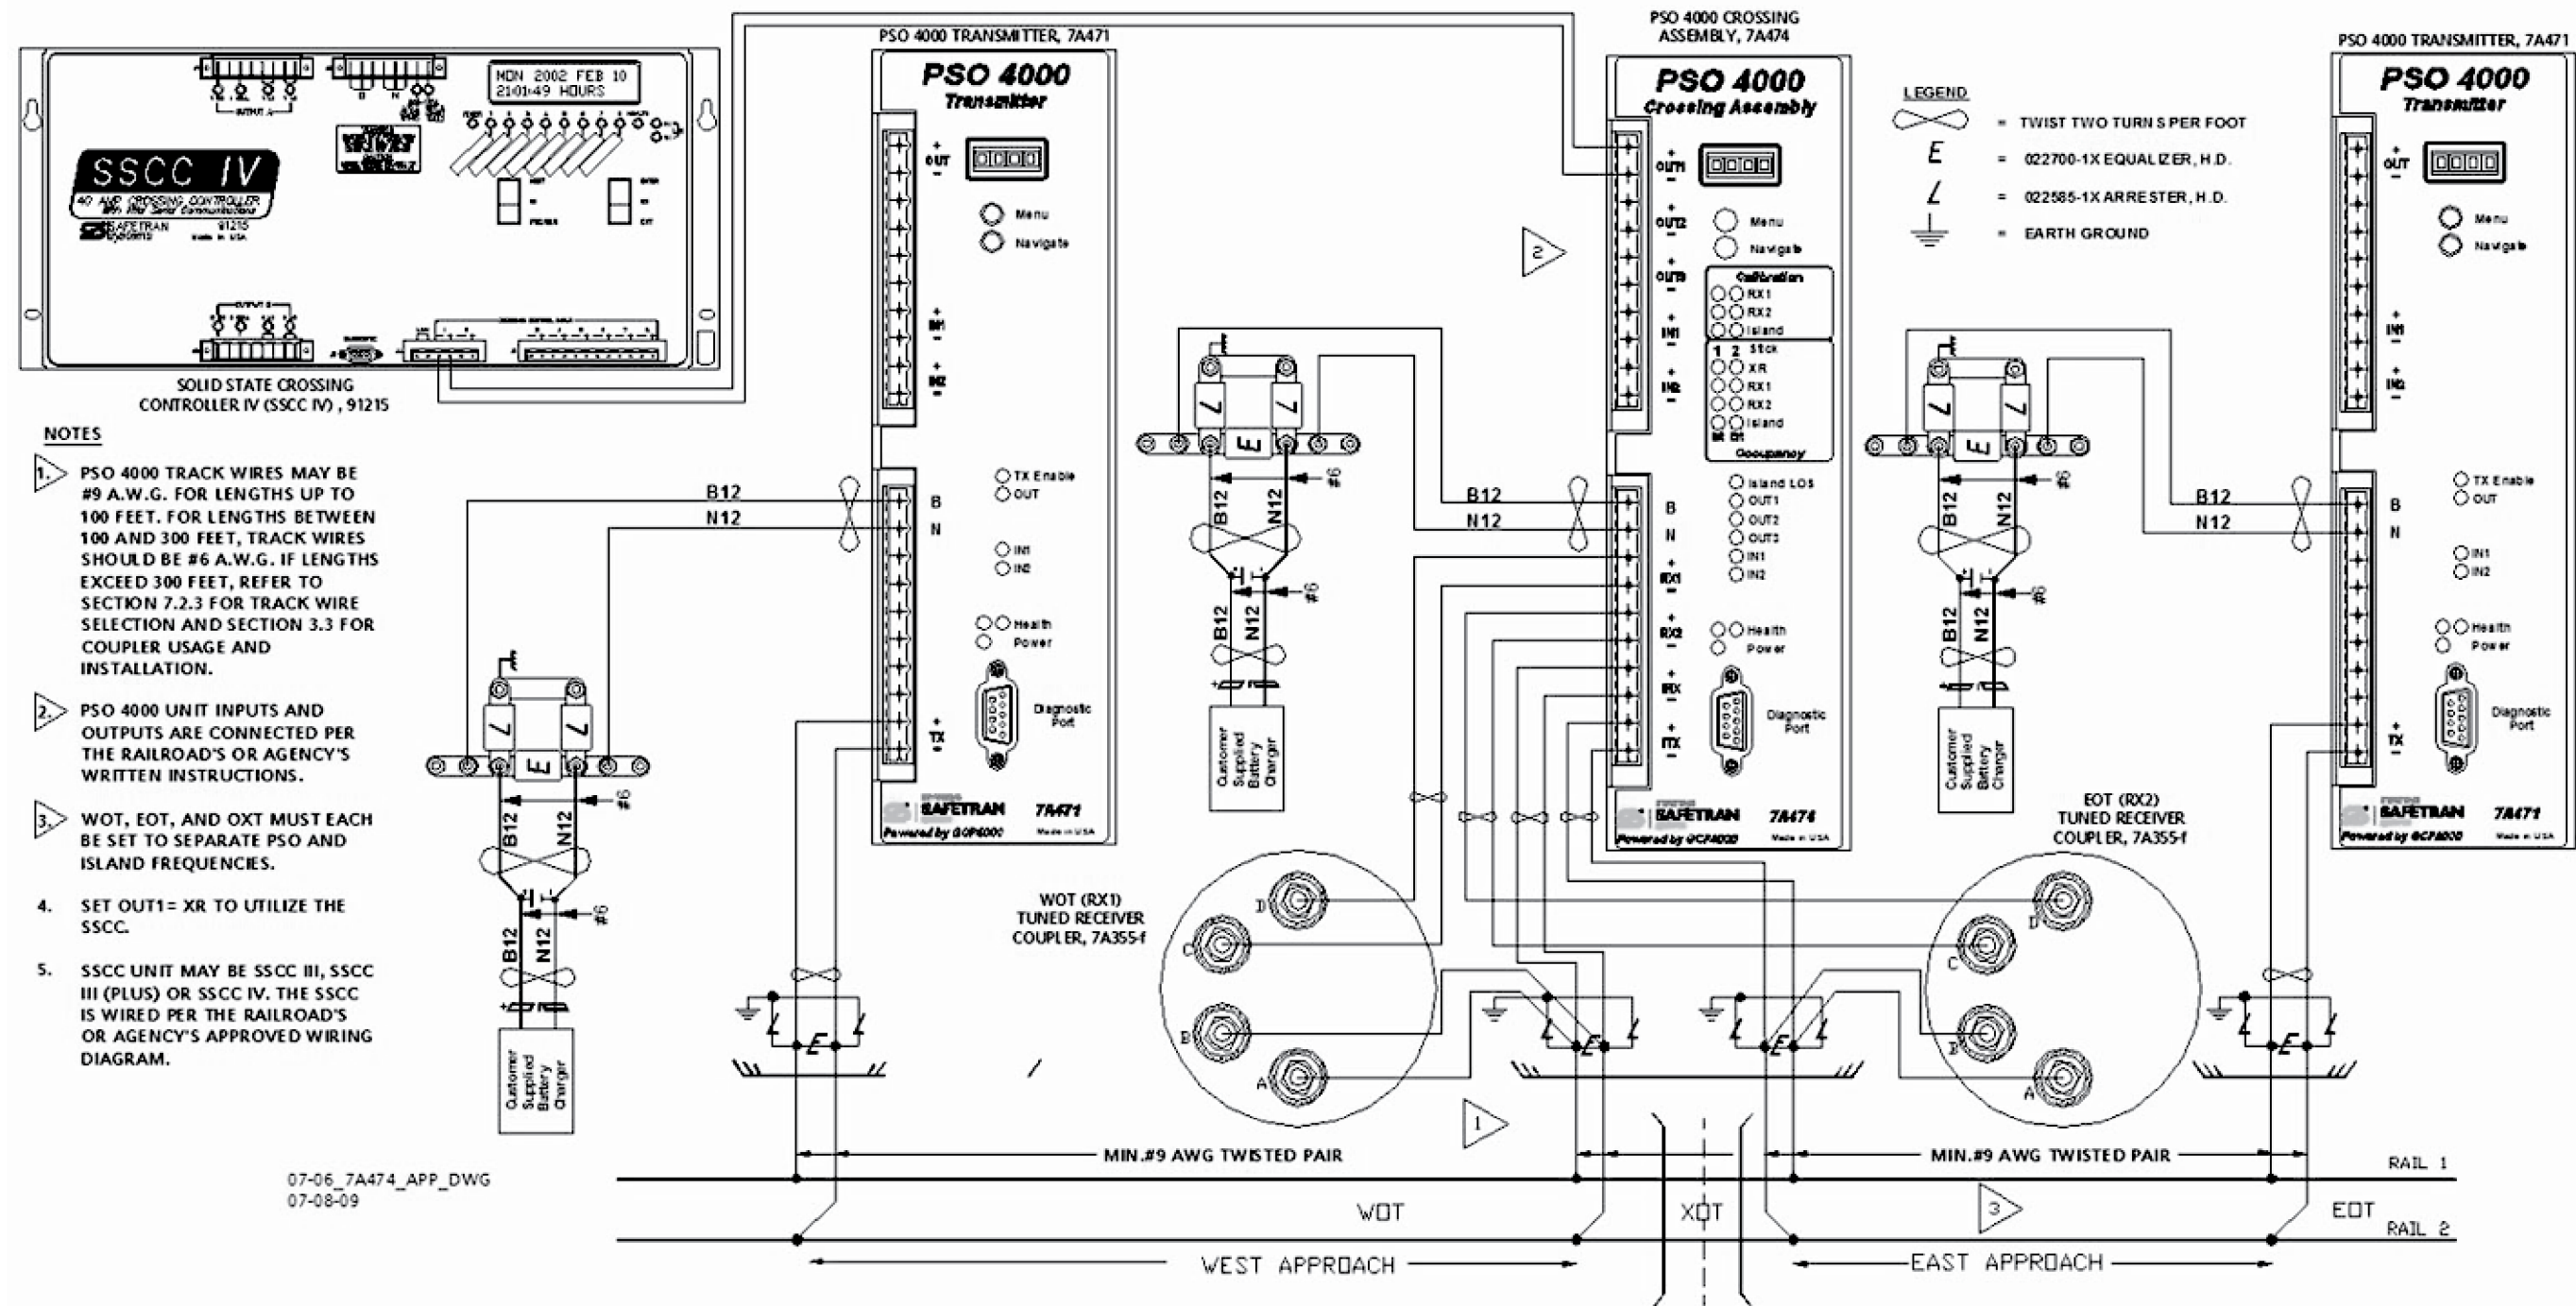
Typical PSO 4000 Crossing Installation Application
